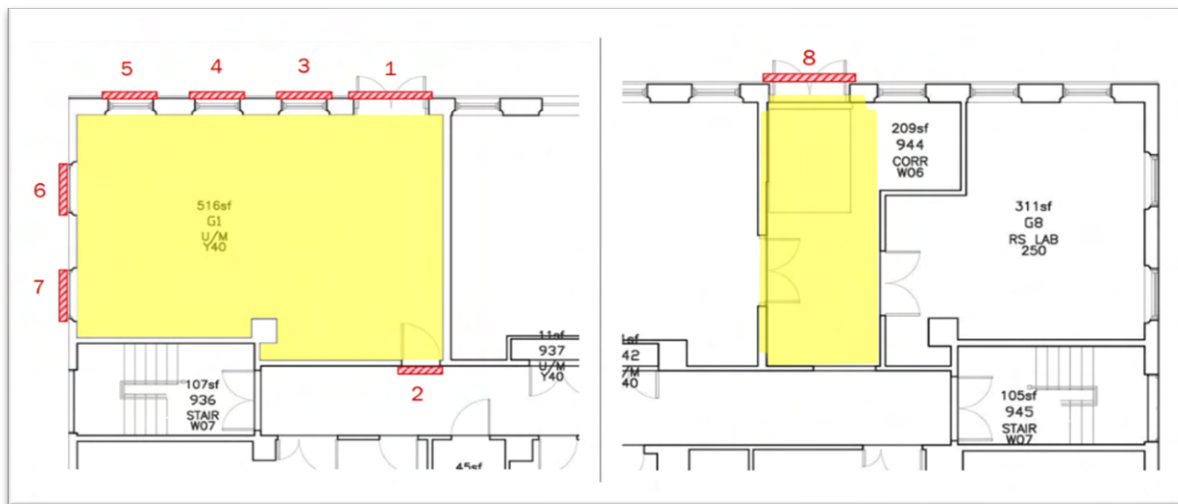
Detailed floor plans of vulnerable rooms and the proposed solutions, including G1 (left) and door 944 (right).
